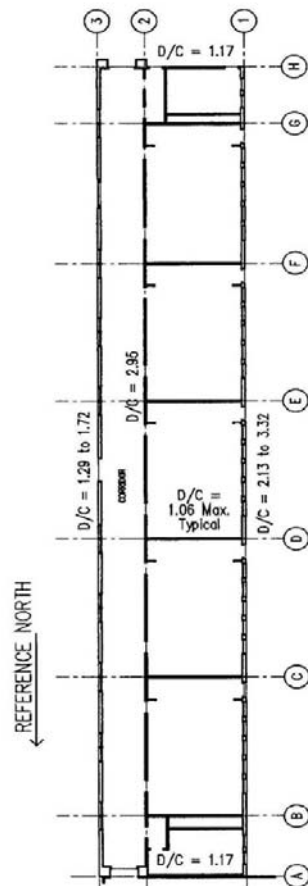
Floor plan of building B. Demand to capacity (D/C) ratios for the principal shear walls are also indicated.
